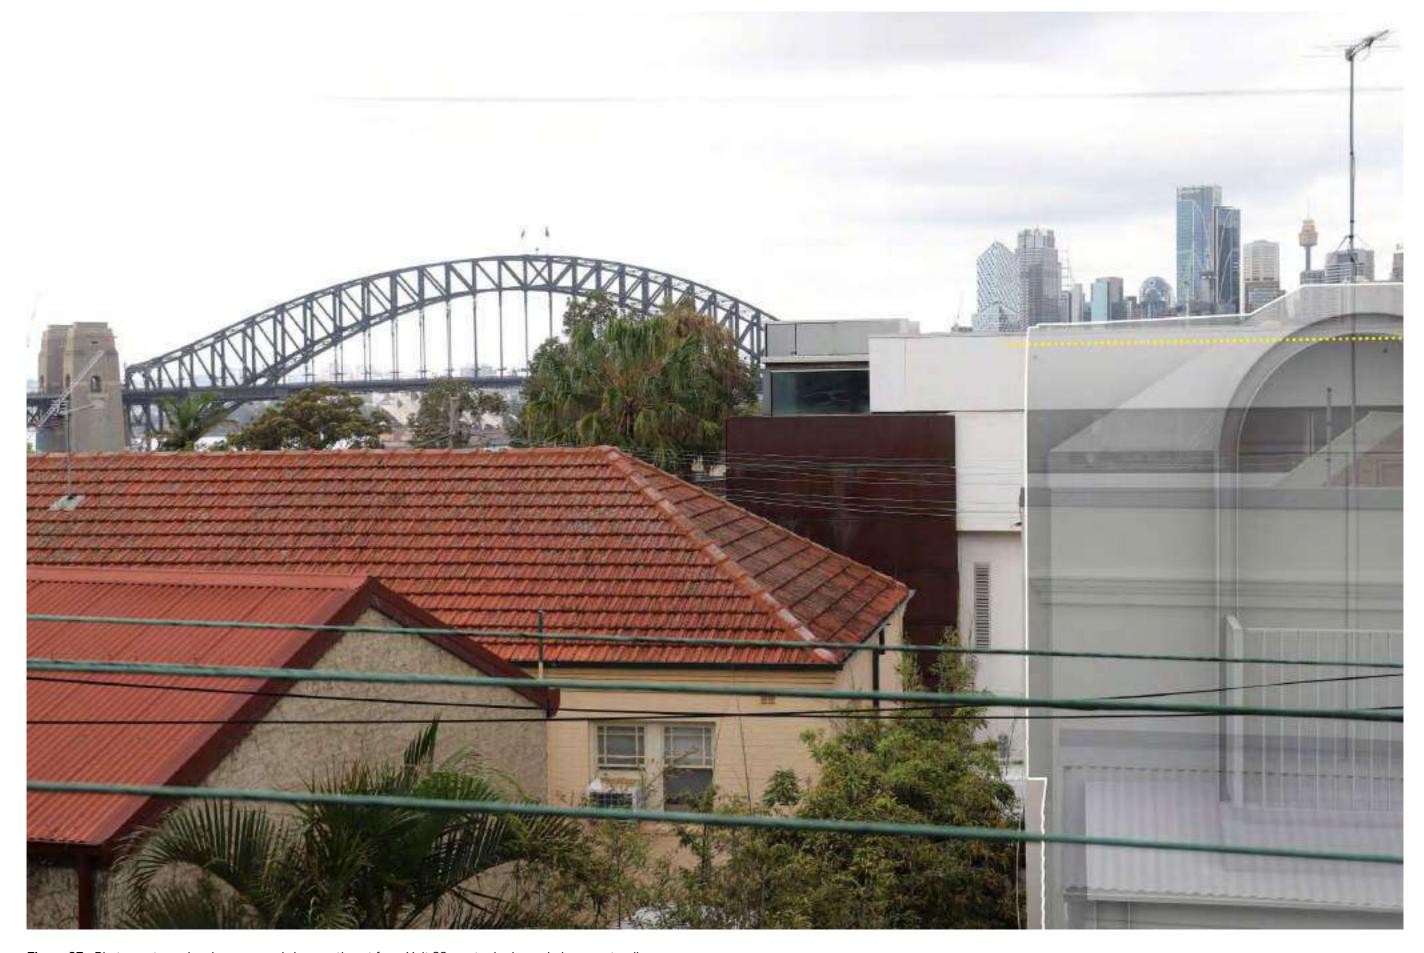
Photomontage showing proposed view southeast from Unit 68 master bedroom balcony – standing
